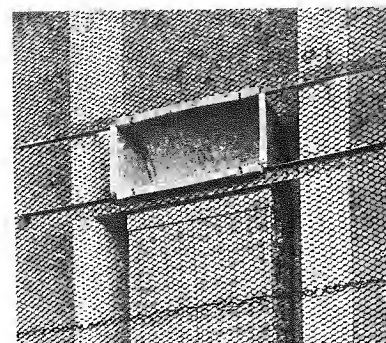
Method of Supporting Air Ducts in Metal Lath Wall. Details are also adapted for Metal Studs.
